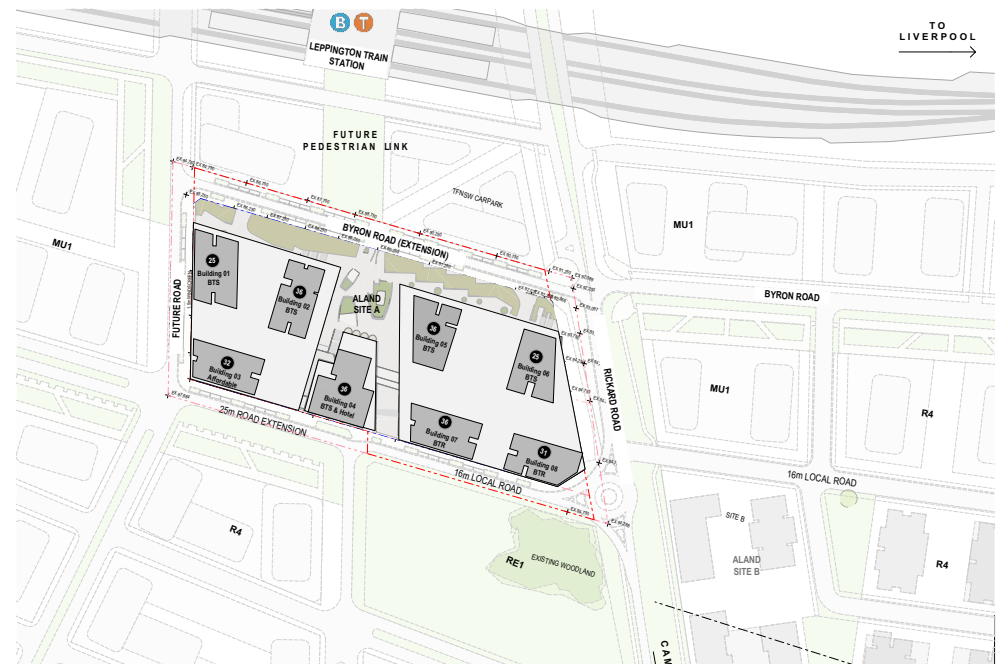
Site & Location Plan, DKO, Preliminary Architectural Drawings, Revision P3, 22/05/2026.
